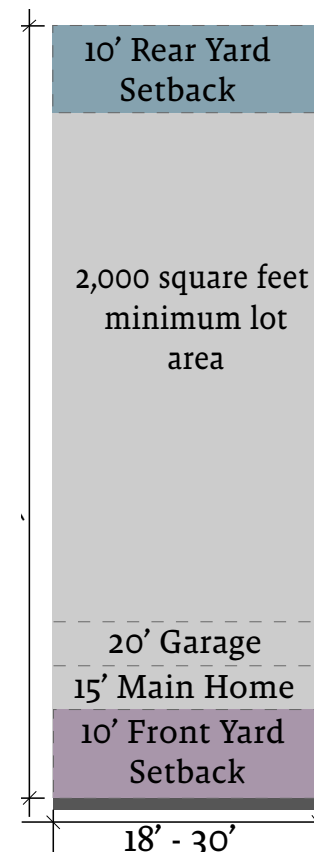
Townhouse Setback Example, See pg. 8 for specifics
